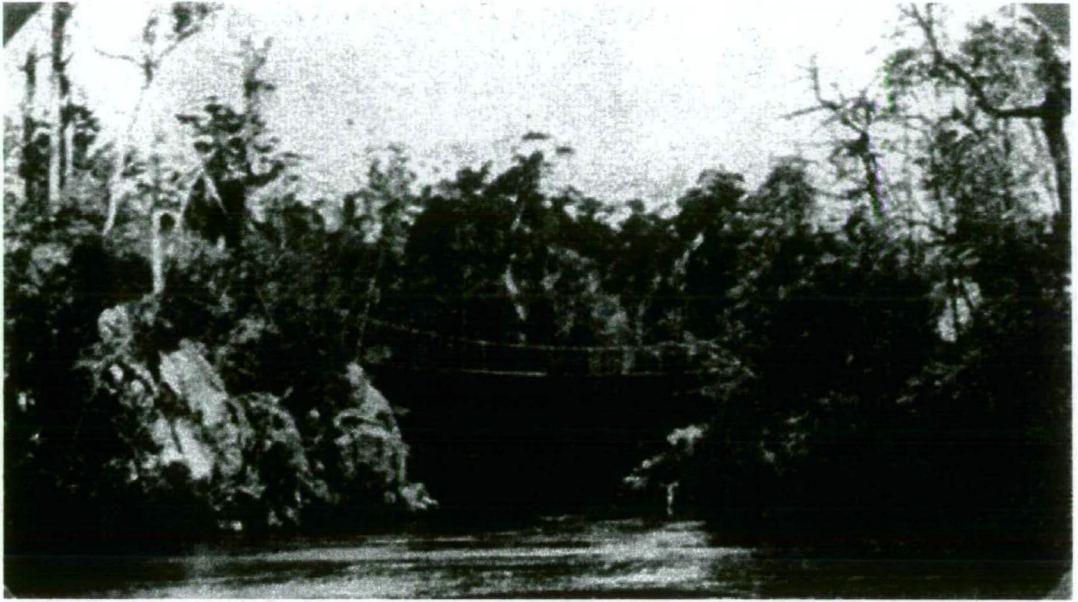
Murchison River Suspension Bridge (WH Judd, *Tasmanian Mail*, October 22, 1904, 24)
